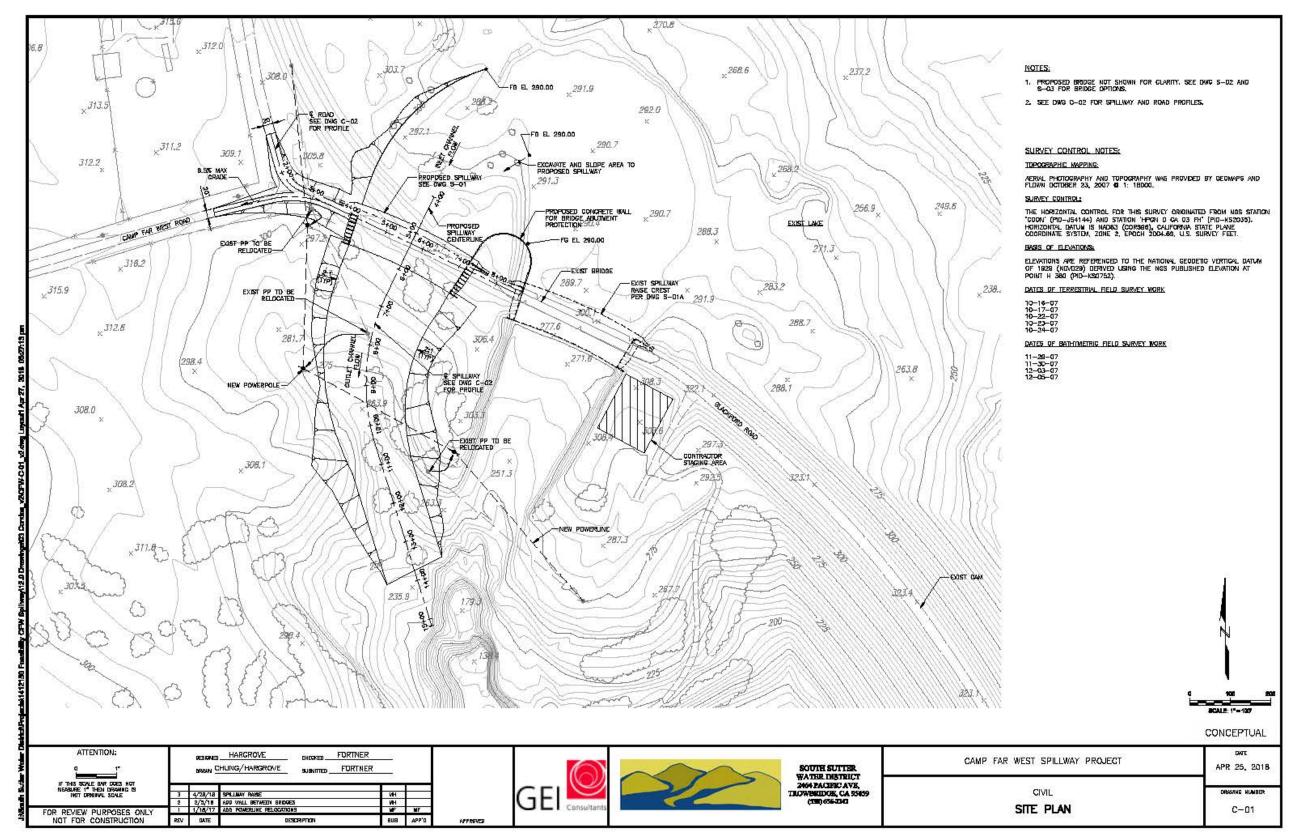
Conceptual level plan for Camp Far West Reservoir Pool Raise – general plan.
